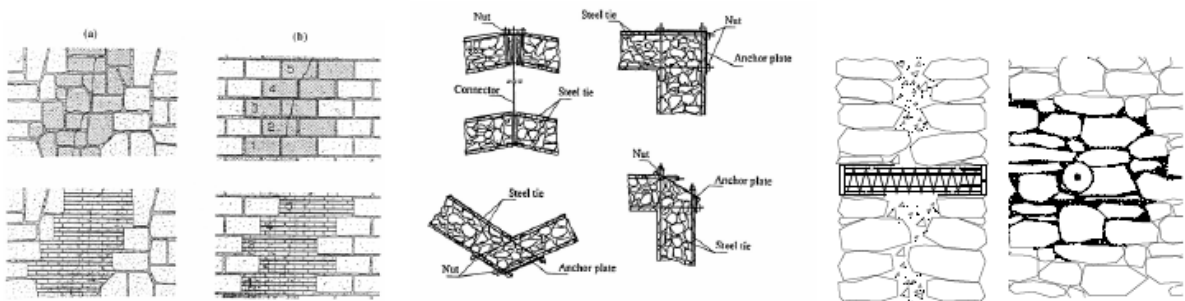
Local connections: a) disconnecting and reconnecting adjacent units, b) installation of steel ties, c) reinforcing steel bars grouted into drilled holes.
